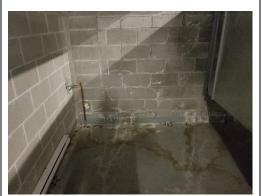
Photo B.- Efflorescence in concrete block firewall due to water ingress in the emergency generator room
